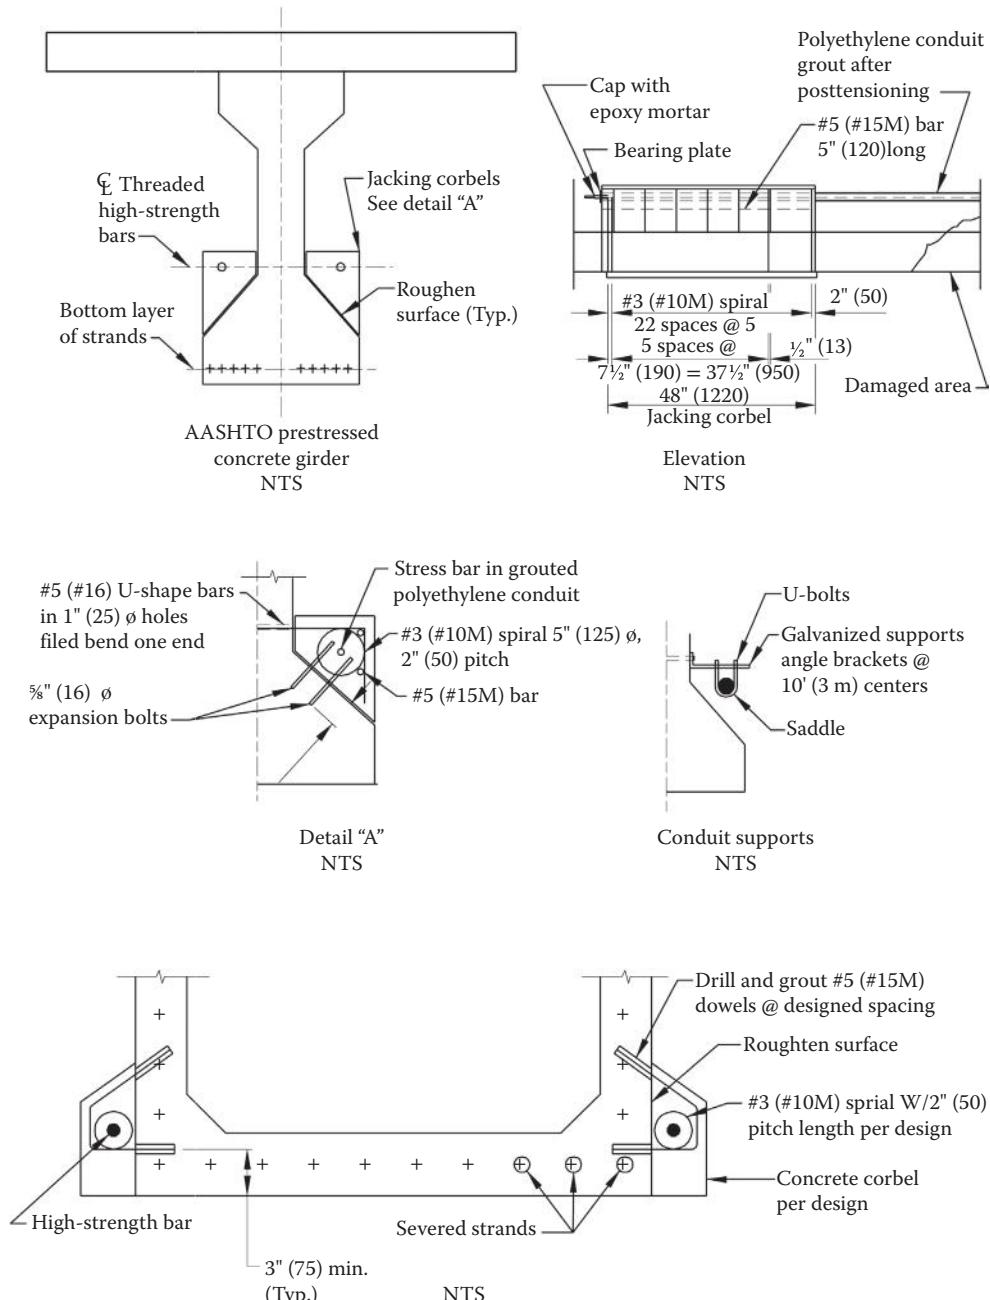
shows typical posttensioning details for concrete girders (DELDOT 2005) where the symmetrical jacking corbels are placed on either side of the damaged area, in the sound sections of the beam, and anchoring them to the bottom flange. Posttensioning tendons are passed through the corbels and anchored against the bearing plates.
